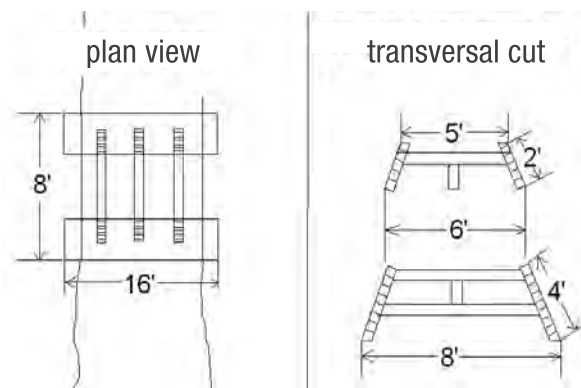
Construction plan for a double wood dam. A traversal cut of the left represents the two sections of the constructed dam separately and assembled in the ditch.
